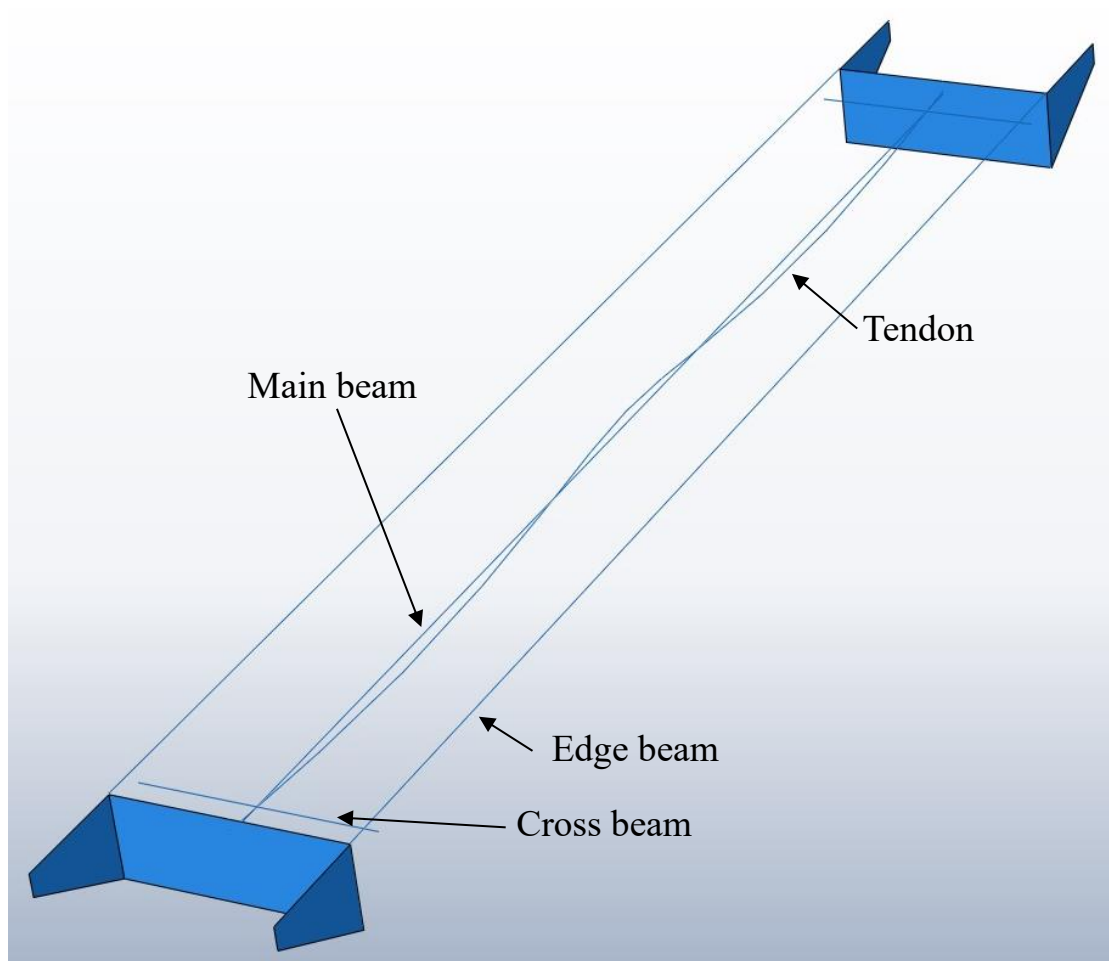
Shape of the bridge from the FE model, excluding the bridge deck to show the different beams and the tendon.
